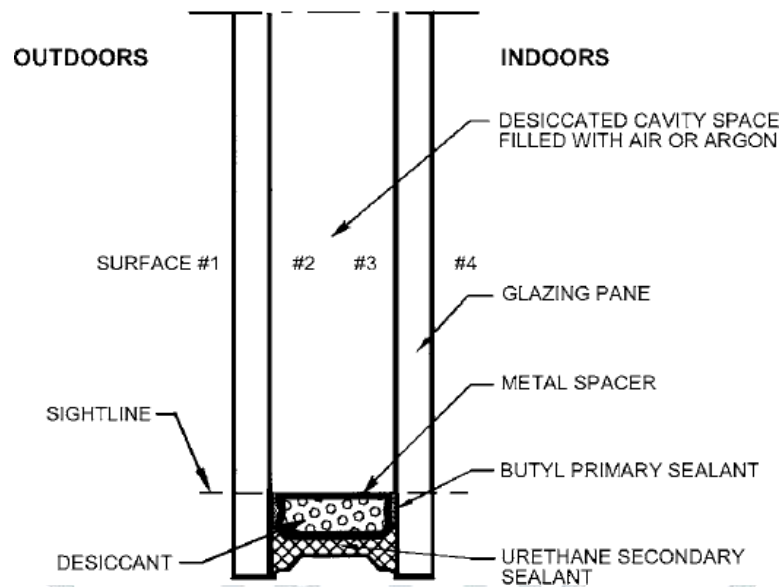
Double-Glazing Unit Construction Detail, (Source: ASHRAE, 2009)
